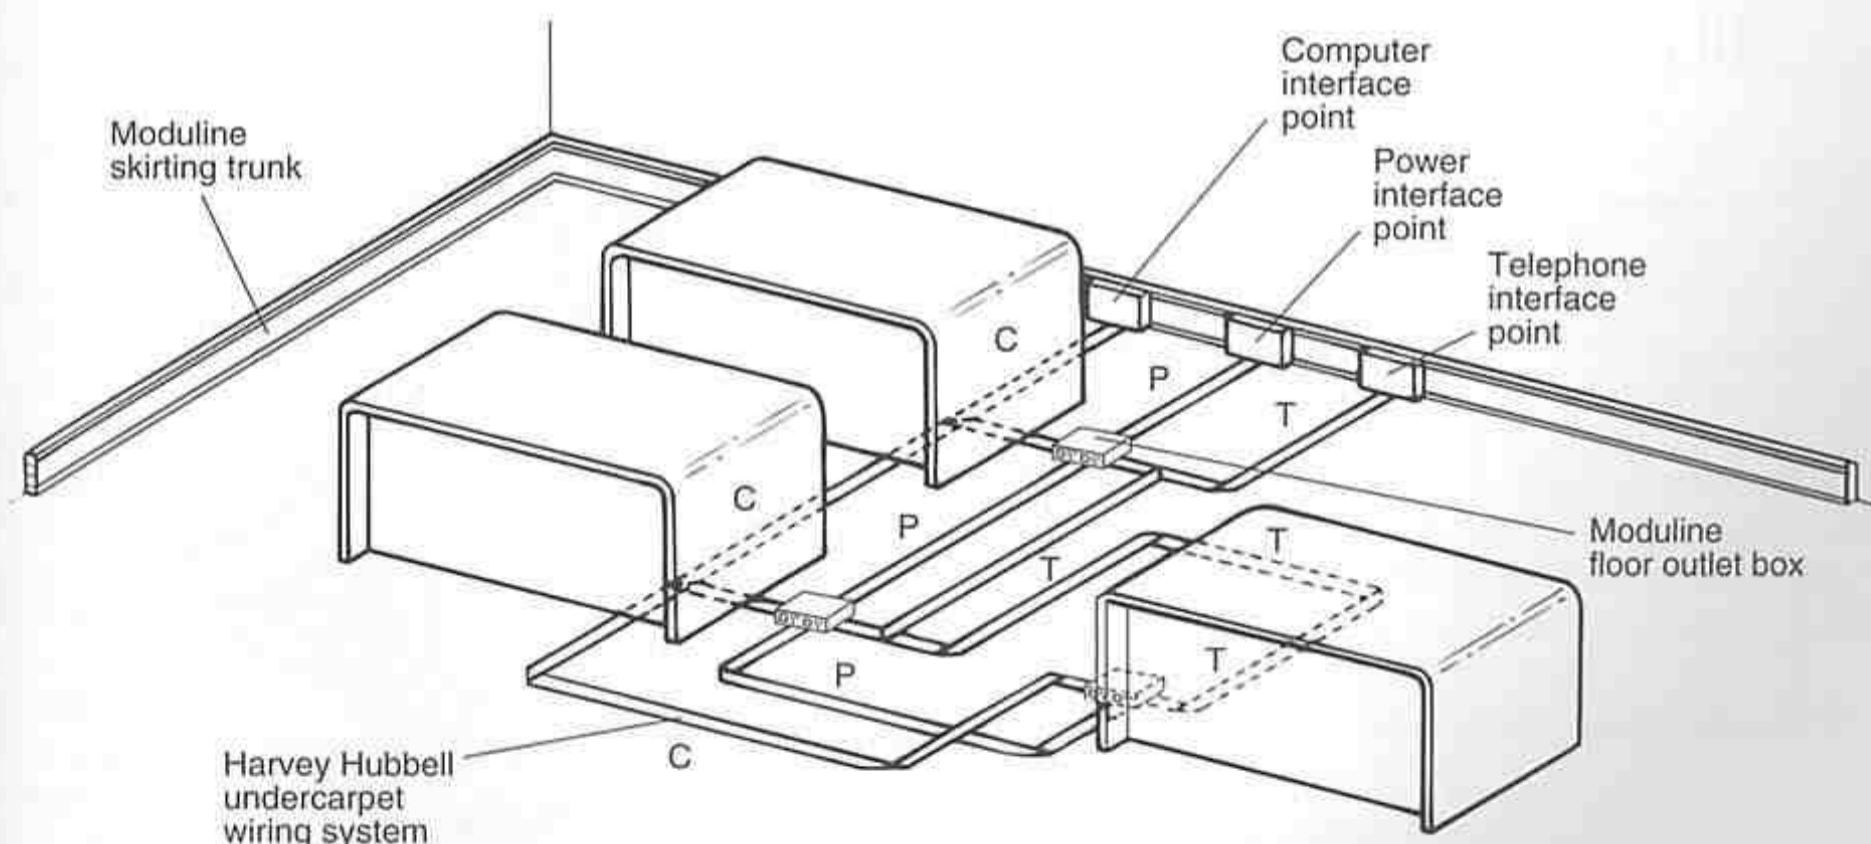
Typical layout for an undercarpet wiring system MODULINE
